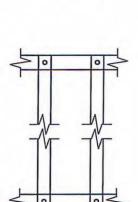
Exterior Connection: Infill Picket Nailed to Rail
